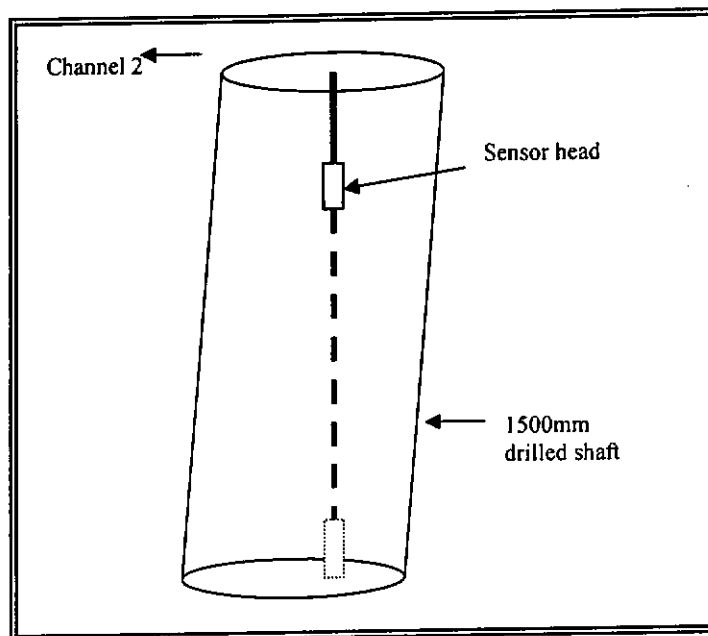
Schematic drawing of a slanted drilled shaft
